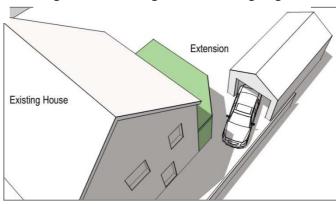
An L shape between the original wall of the house and the new extension could prevent over shadowing of the neighbouring property without an extension
